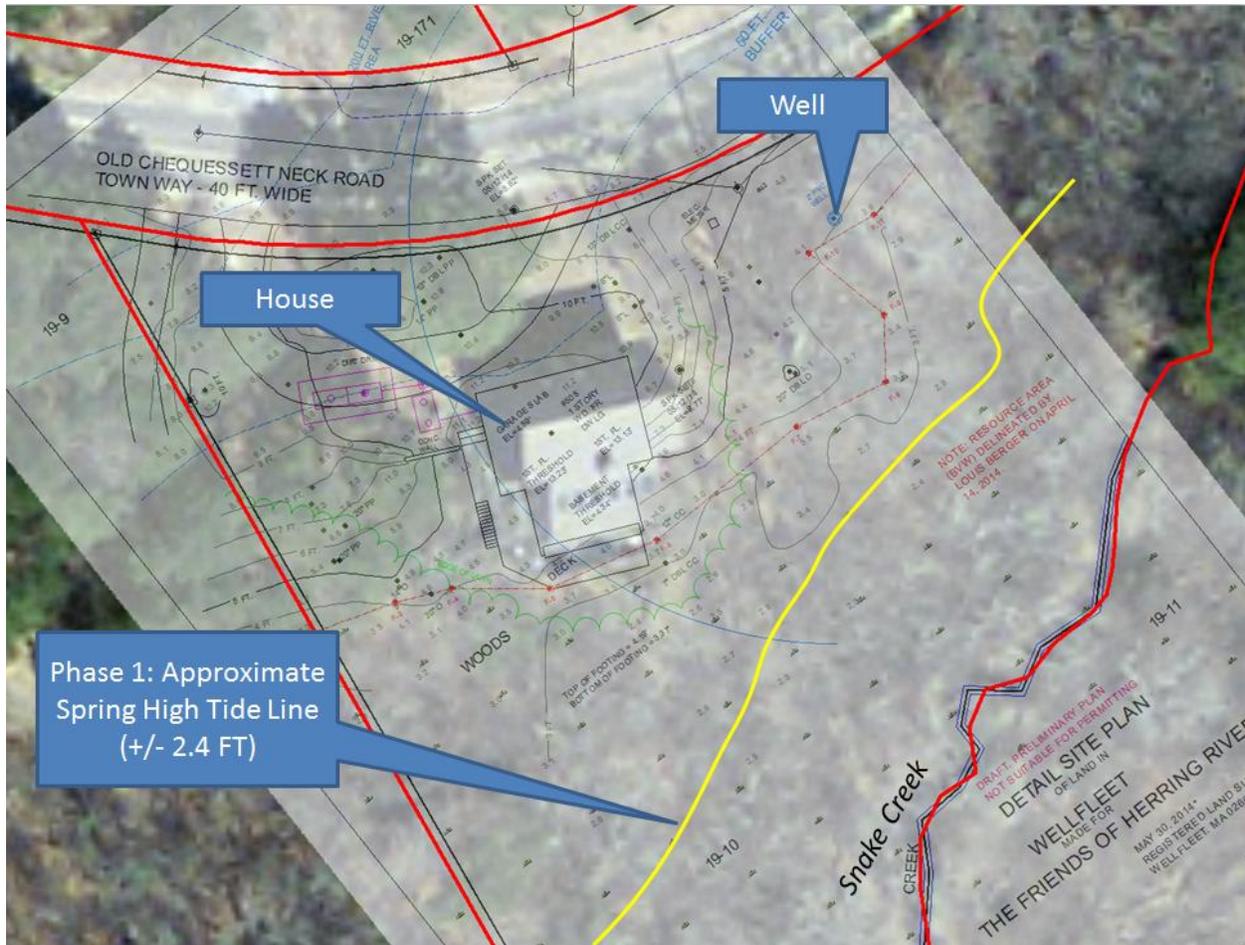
Site plan of the property at 505 Chequessett Neck Road.
